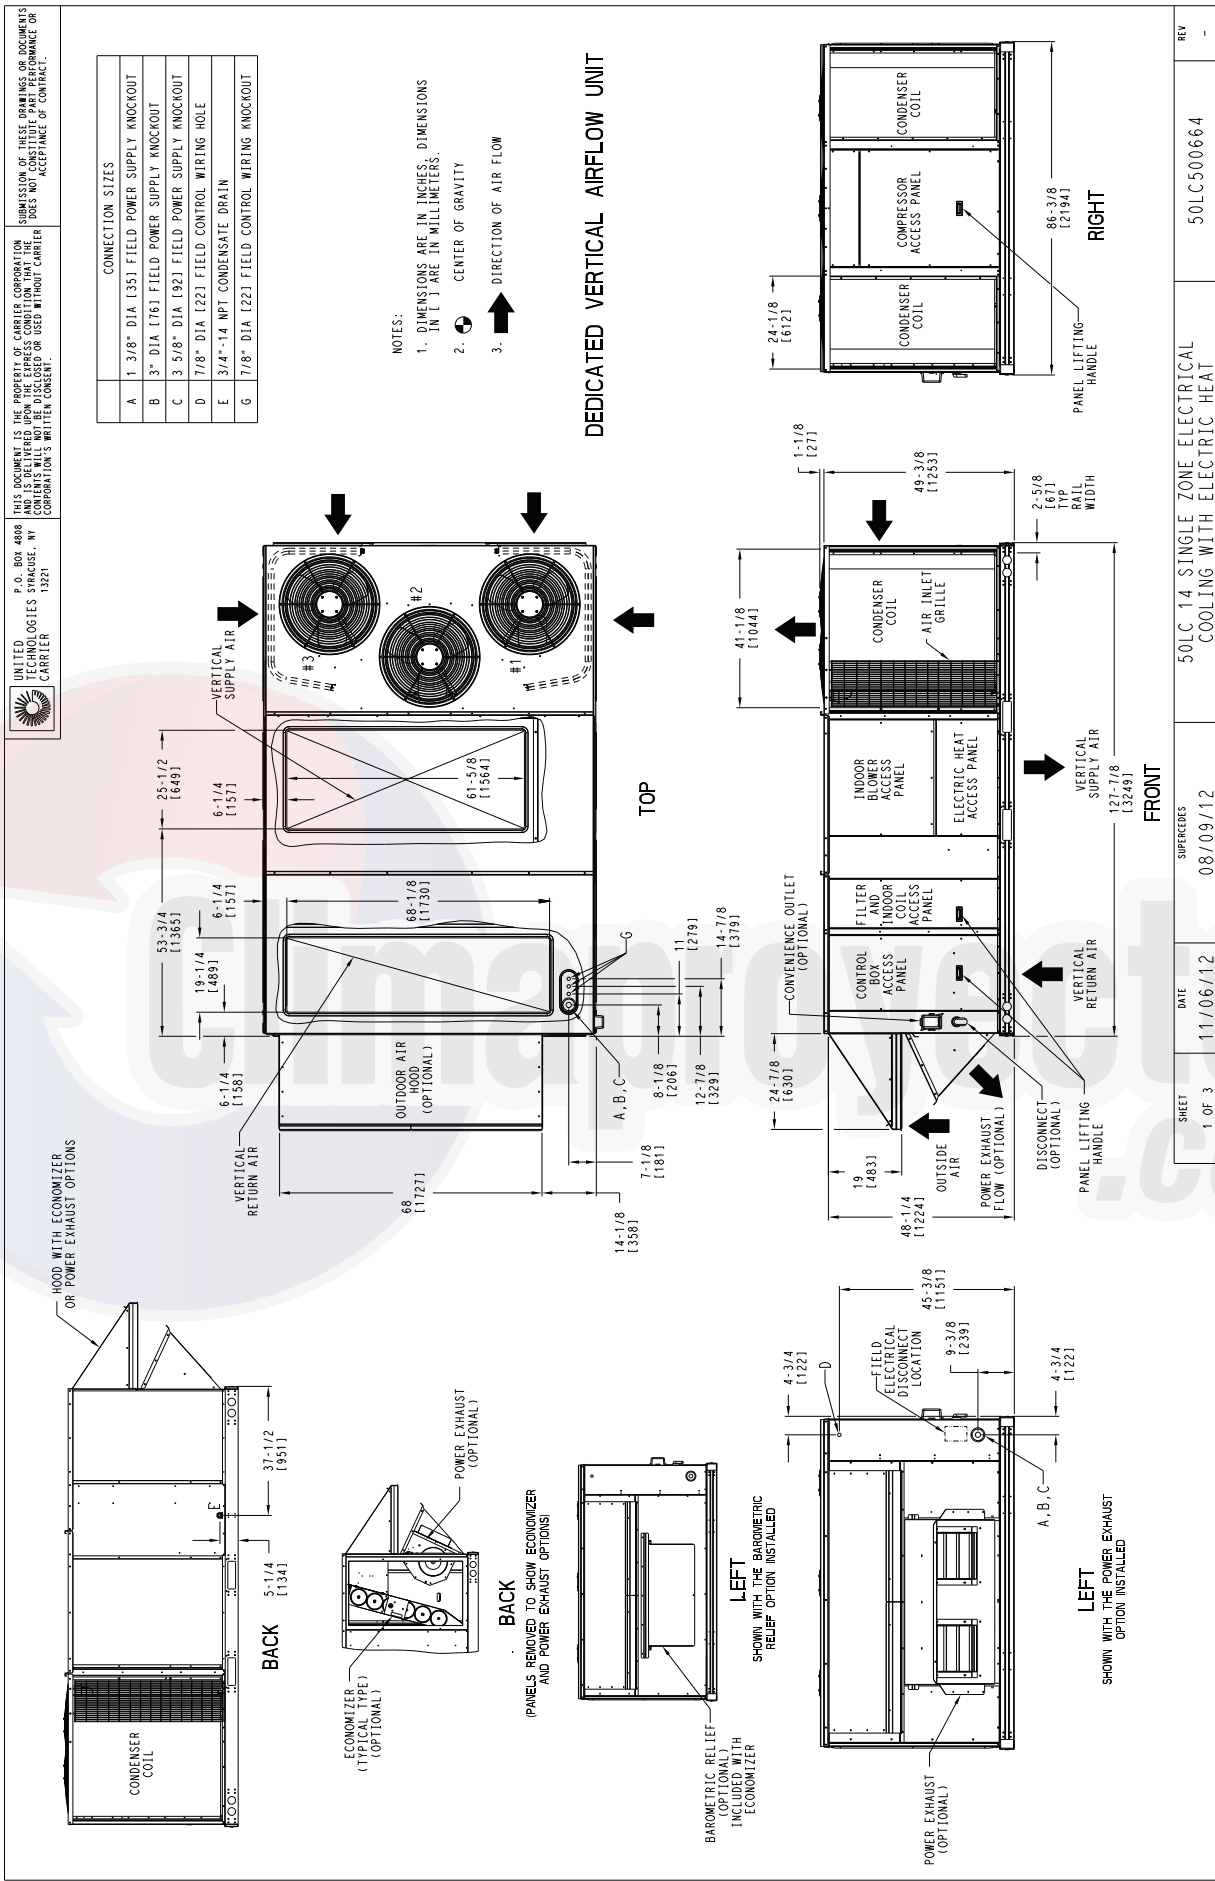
Unit Dimensional Drawing - 14 Size Unit, Sheet 1 of 3
